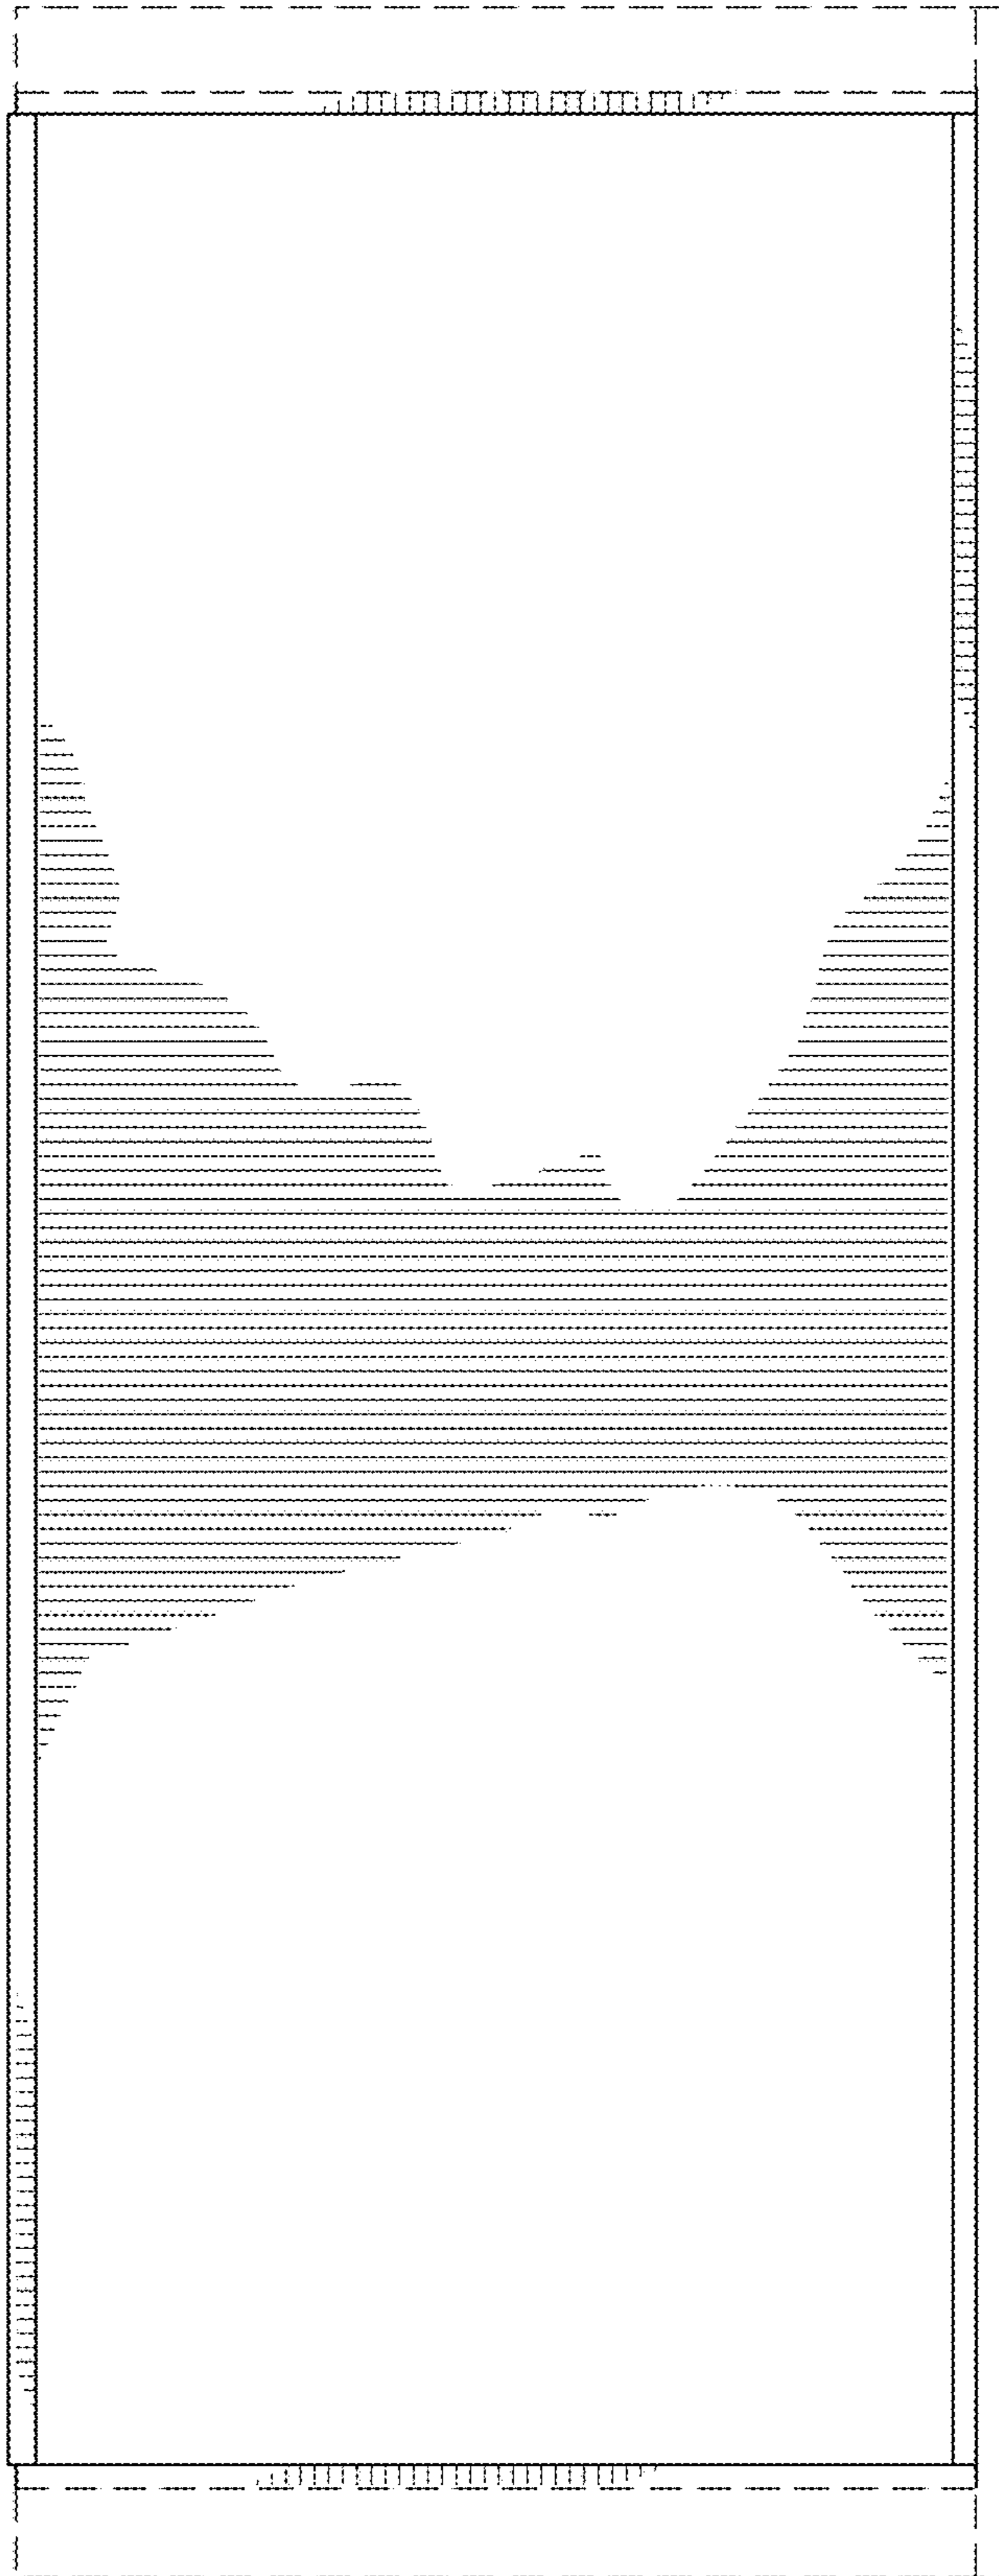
is another front side view of the wall building panel of the present invention in a mounted position; and,
